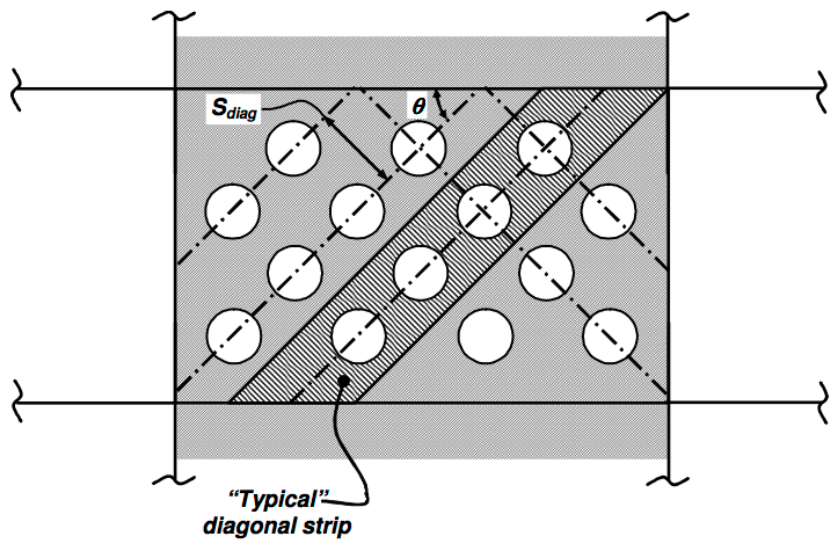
Schematic Detail of Special Perforated Plate Shear Wall
